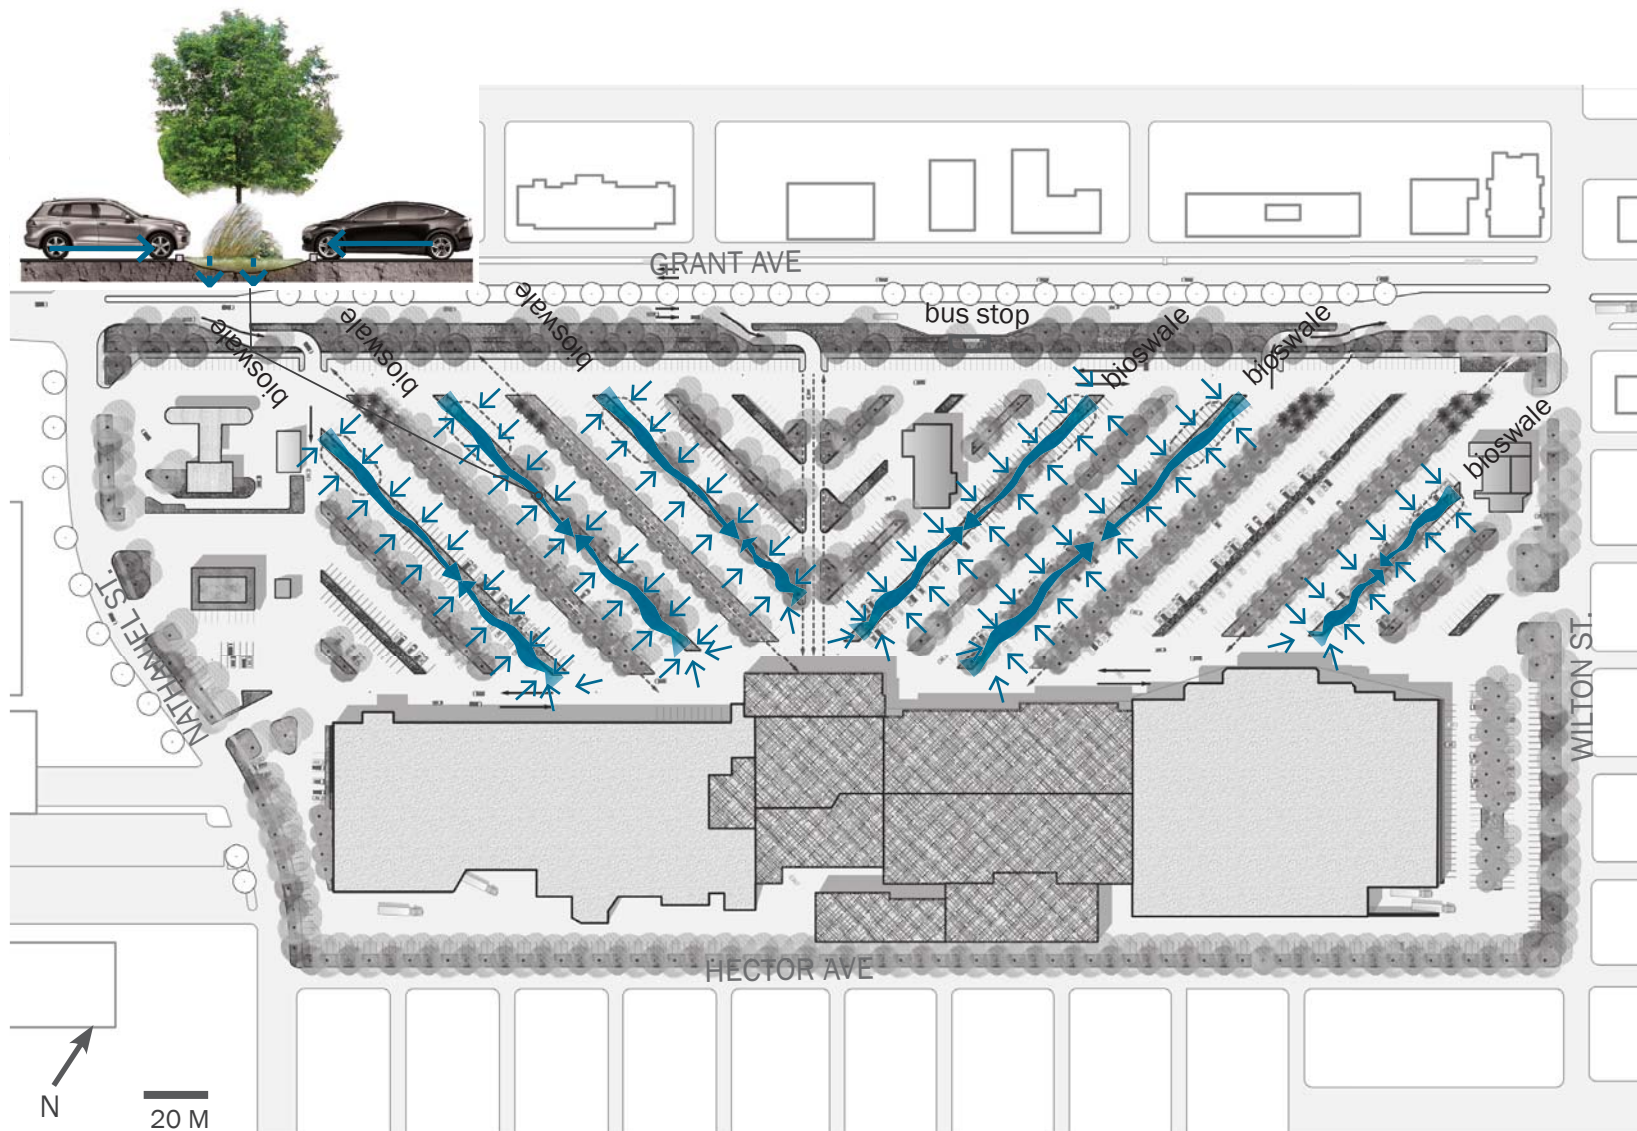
Site Plan showing bioswale system + flow within the parking lot.
